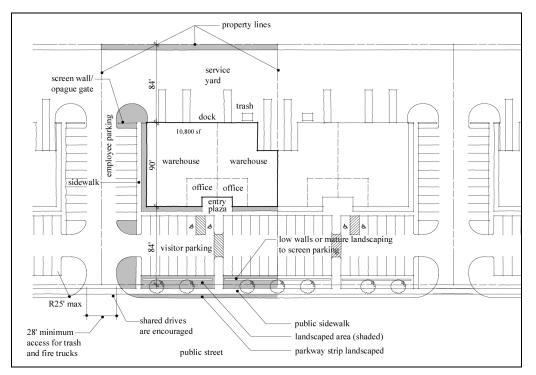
Zero Lot Line Layout Traffic circulation and Parking with Setbacks
